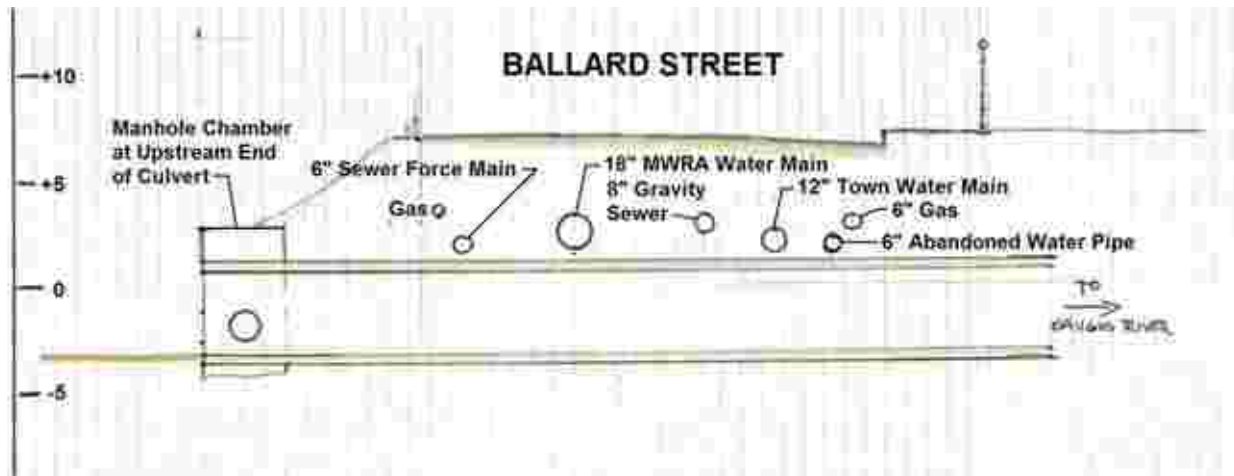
Profile of Ballard Street Culvert ("BA-1") Showing Utility Pipes Below Roadway
